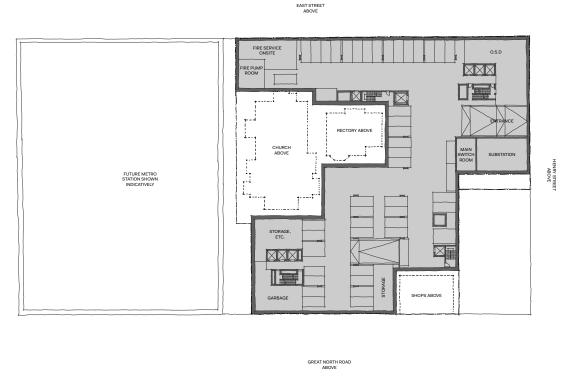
"Basement Typical" plan from Urban Design Report (Carter Williamson, 2023).
